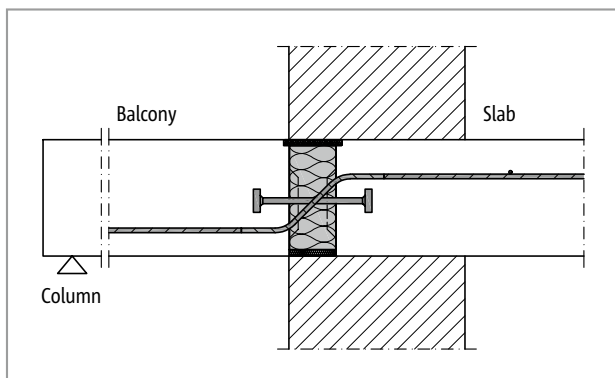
Schöck Isokorb® T type Q-P: Connection of supported balcony with thermal insulating cavity wall
